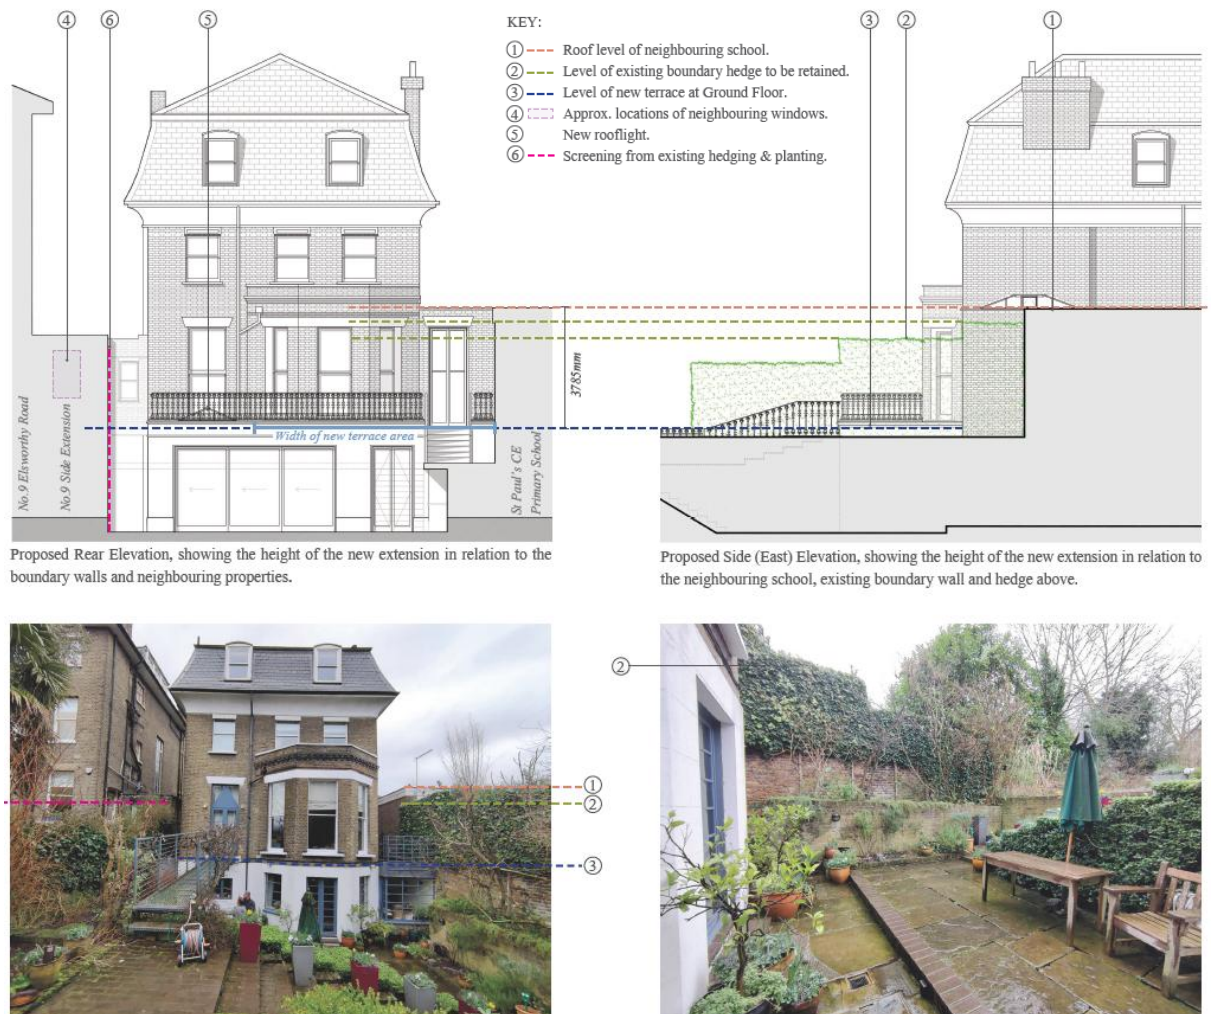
Privacy Plans and Photos (Source: Studio Kyson)
